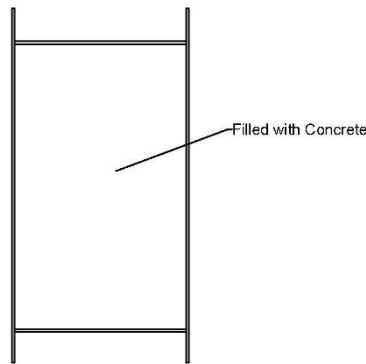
Steel Barrier with Cavity for Concrete Ballast
